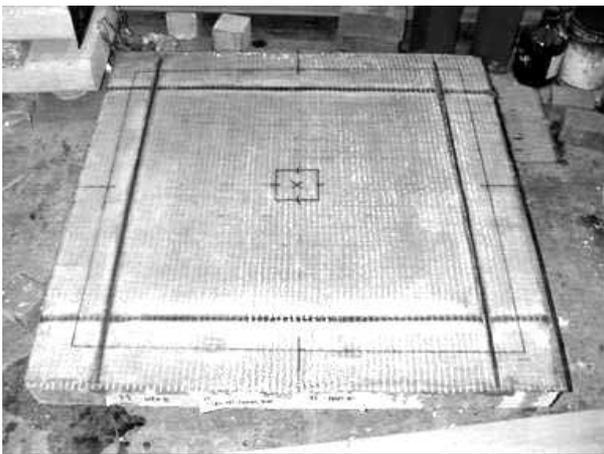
Layout of embedded steel bar anchorage system. (Tan et al, 2003)
